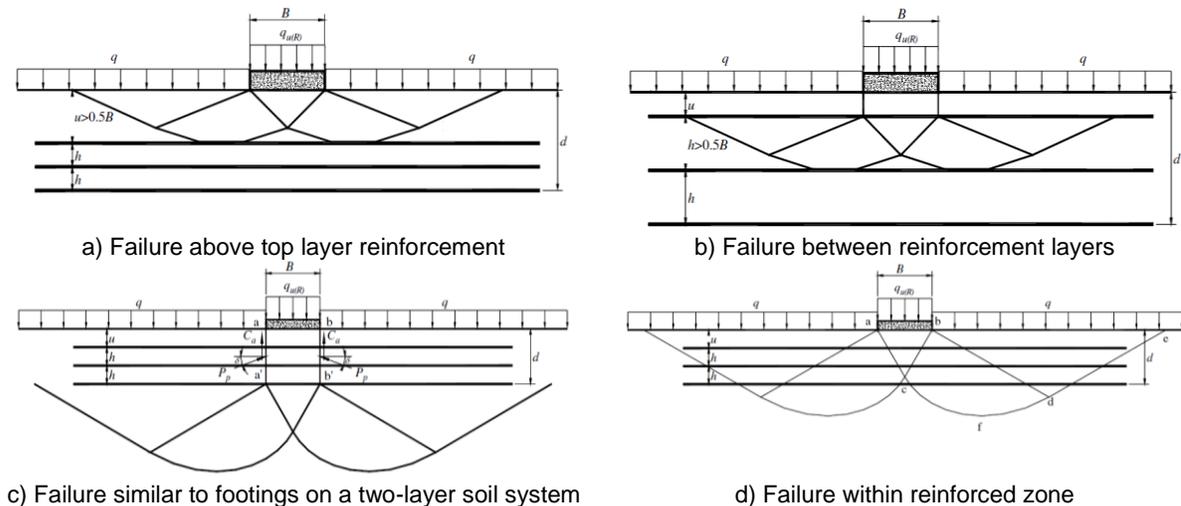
Failure modes of reinforced soil foundation. (Sharma *et al.*, 2009)
